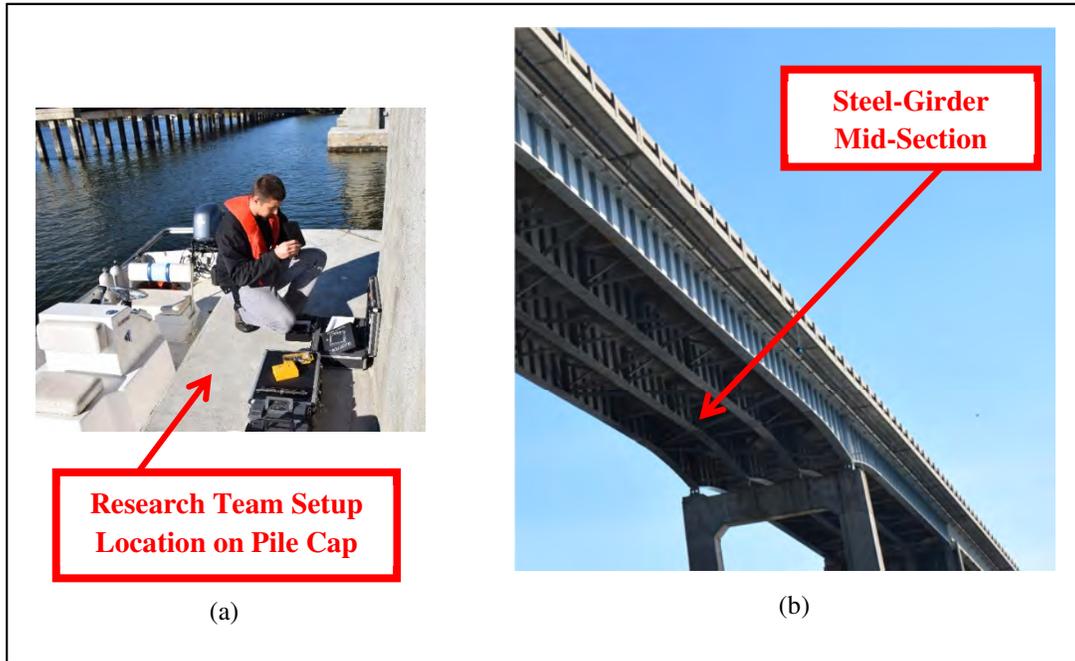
Concrete Bridge with Steel-Girder Mid-Section
